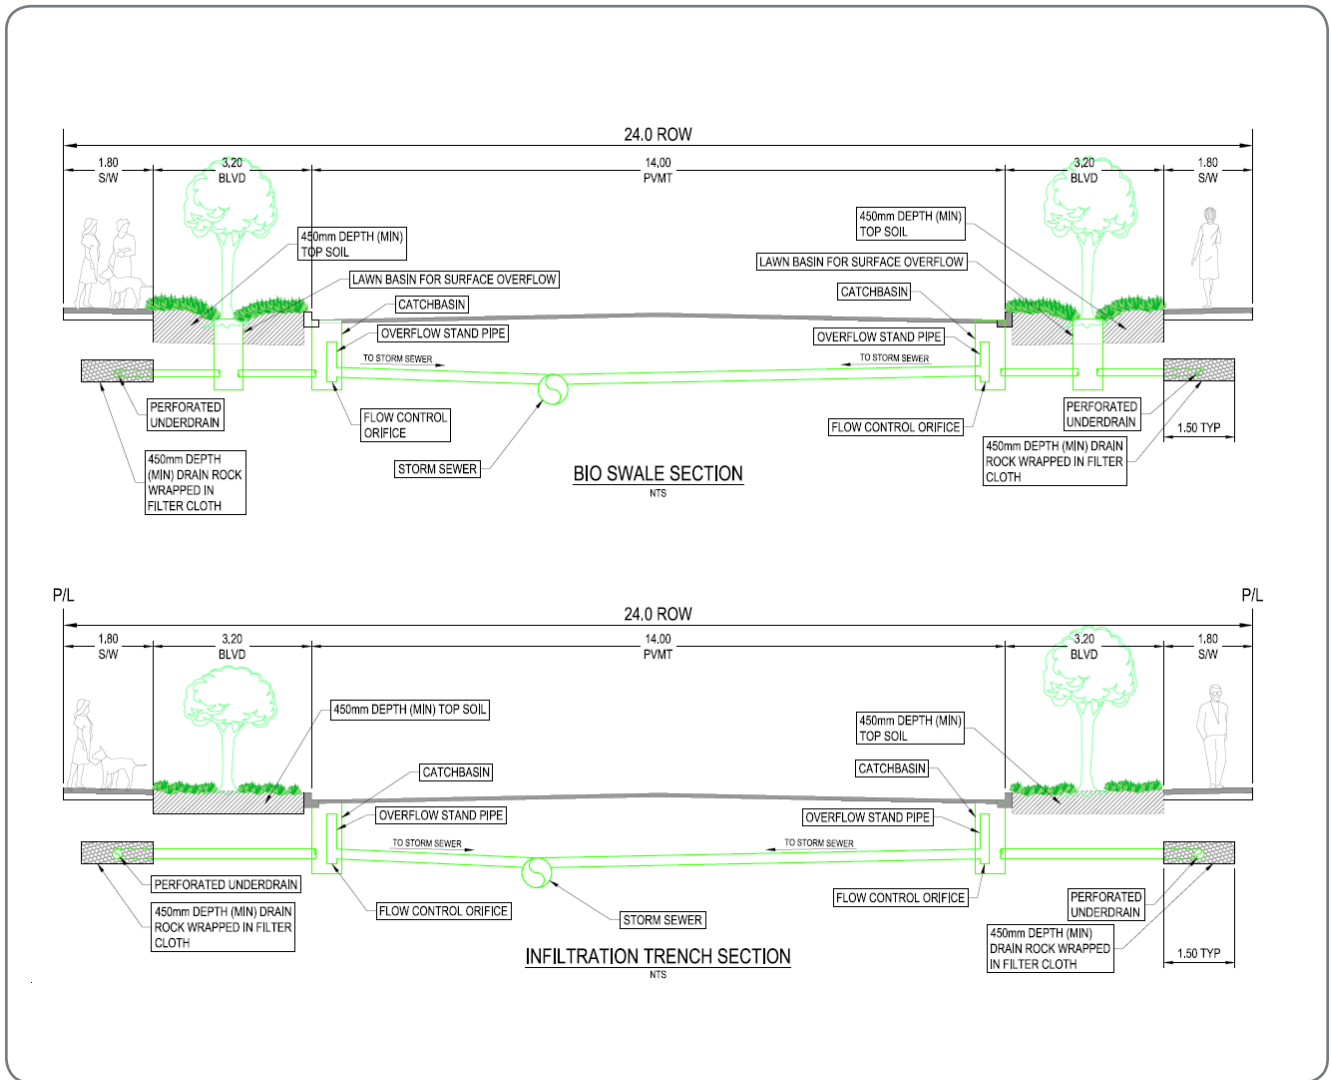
24 M Road Right-of-Way Bioswale & Infiltration Trench Cross-sections
